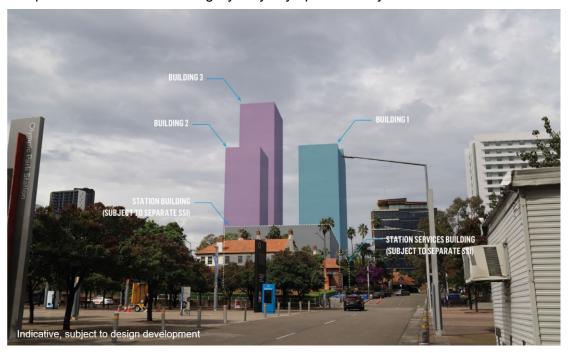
Proposed visual impacts from Showground Road and Murray Avenue
